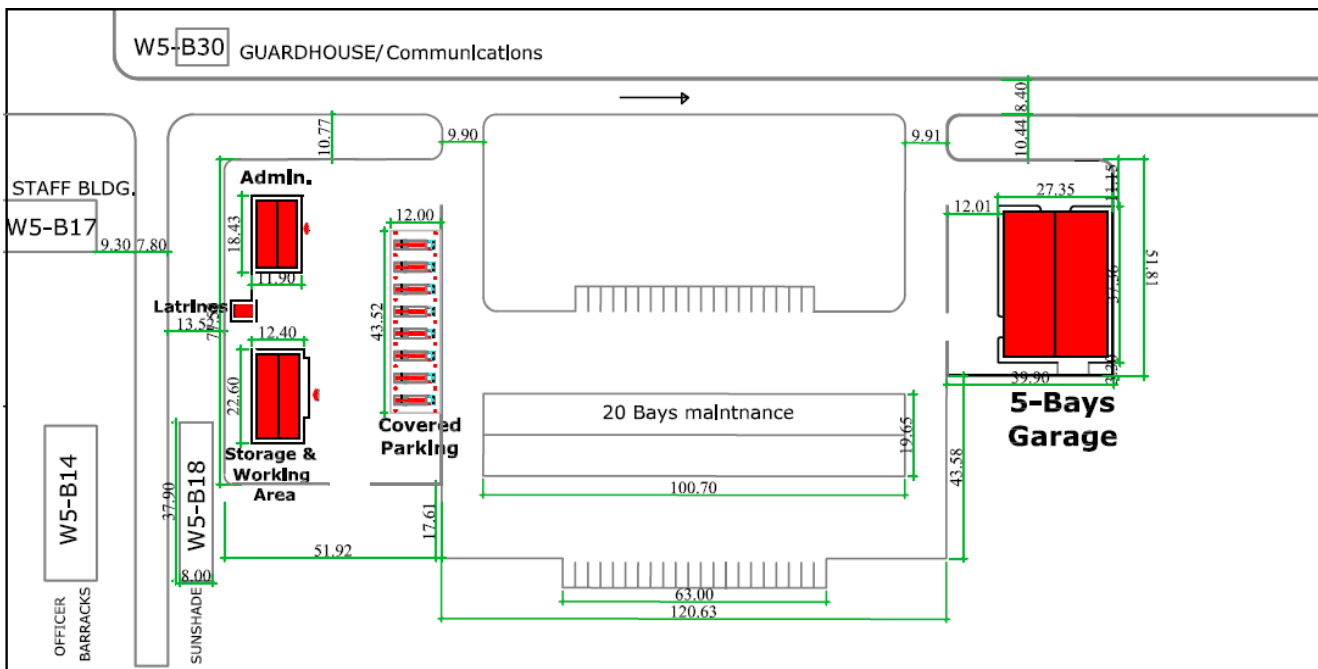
Reclamation platoon layout (Courtesy of USACE)
